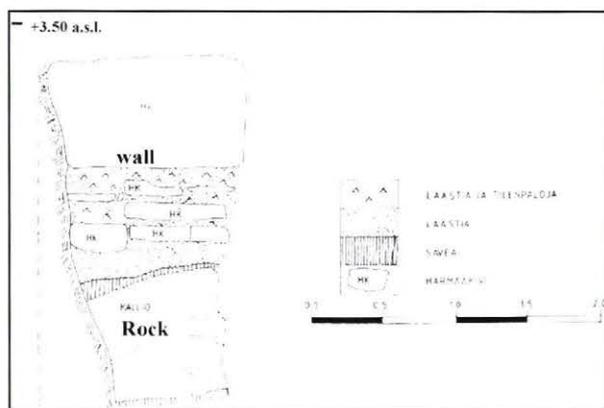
Foundation of the west wall of tower 12 of Kuusisto Castle. Tower 12, located on the northwest side of the main castle, was built on bedrock as a mortared stone wall at elevation ca. +1.70-+1.80 a.s.l. (The archives of the Dept. of Monuments and Sites, NBA, Kuusisto Castle.)
